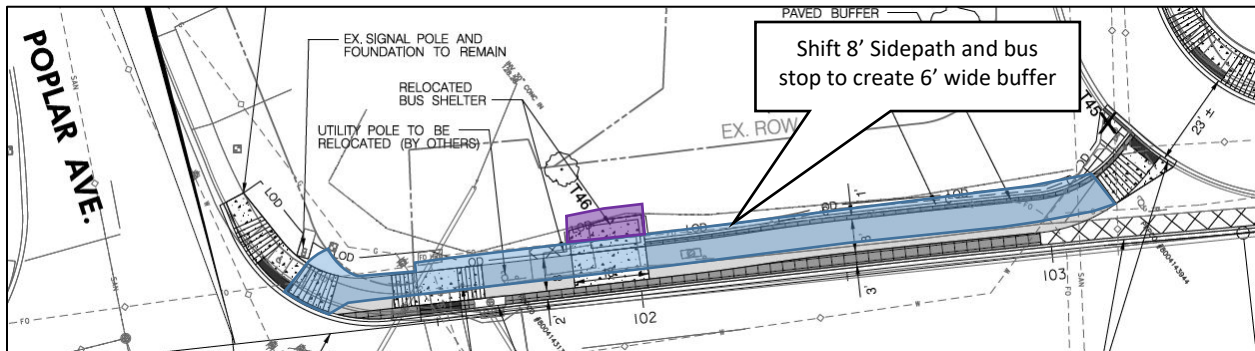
New Ave Bikeway at Poplar Avenue to Conway Avenue – Proposed Modifications
